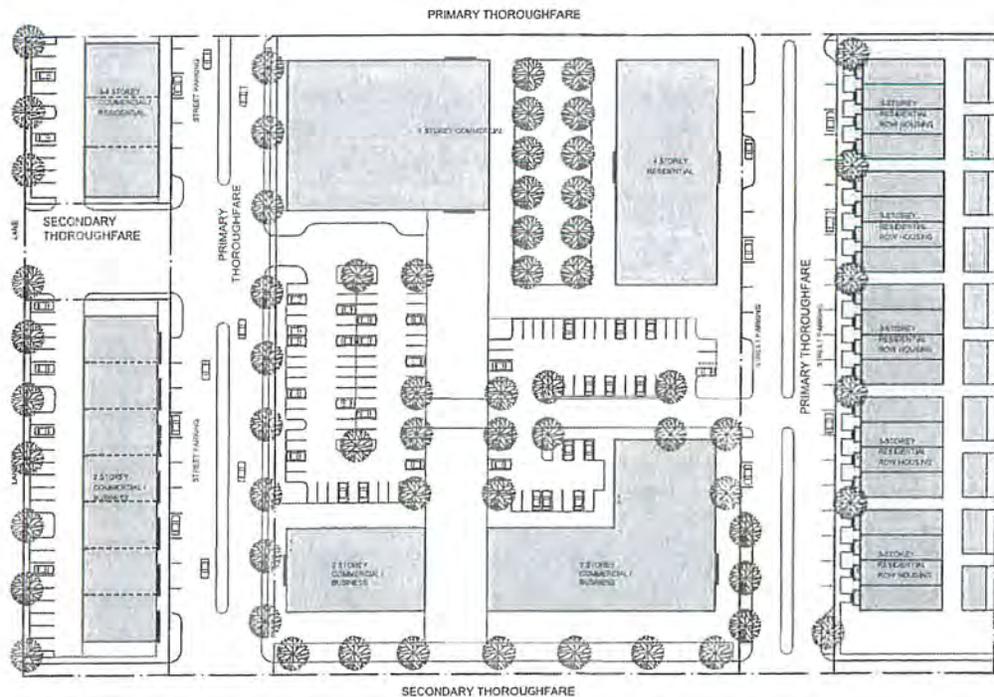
Illustrative example of Buildings and Site arrangement in the Neighbourhood Core District
